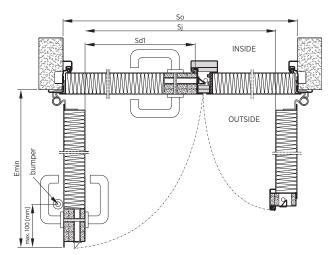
Installation of a double-leaf door in a corner frame - horizontal cross-section
